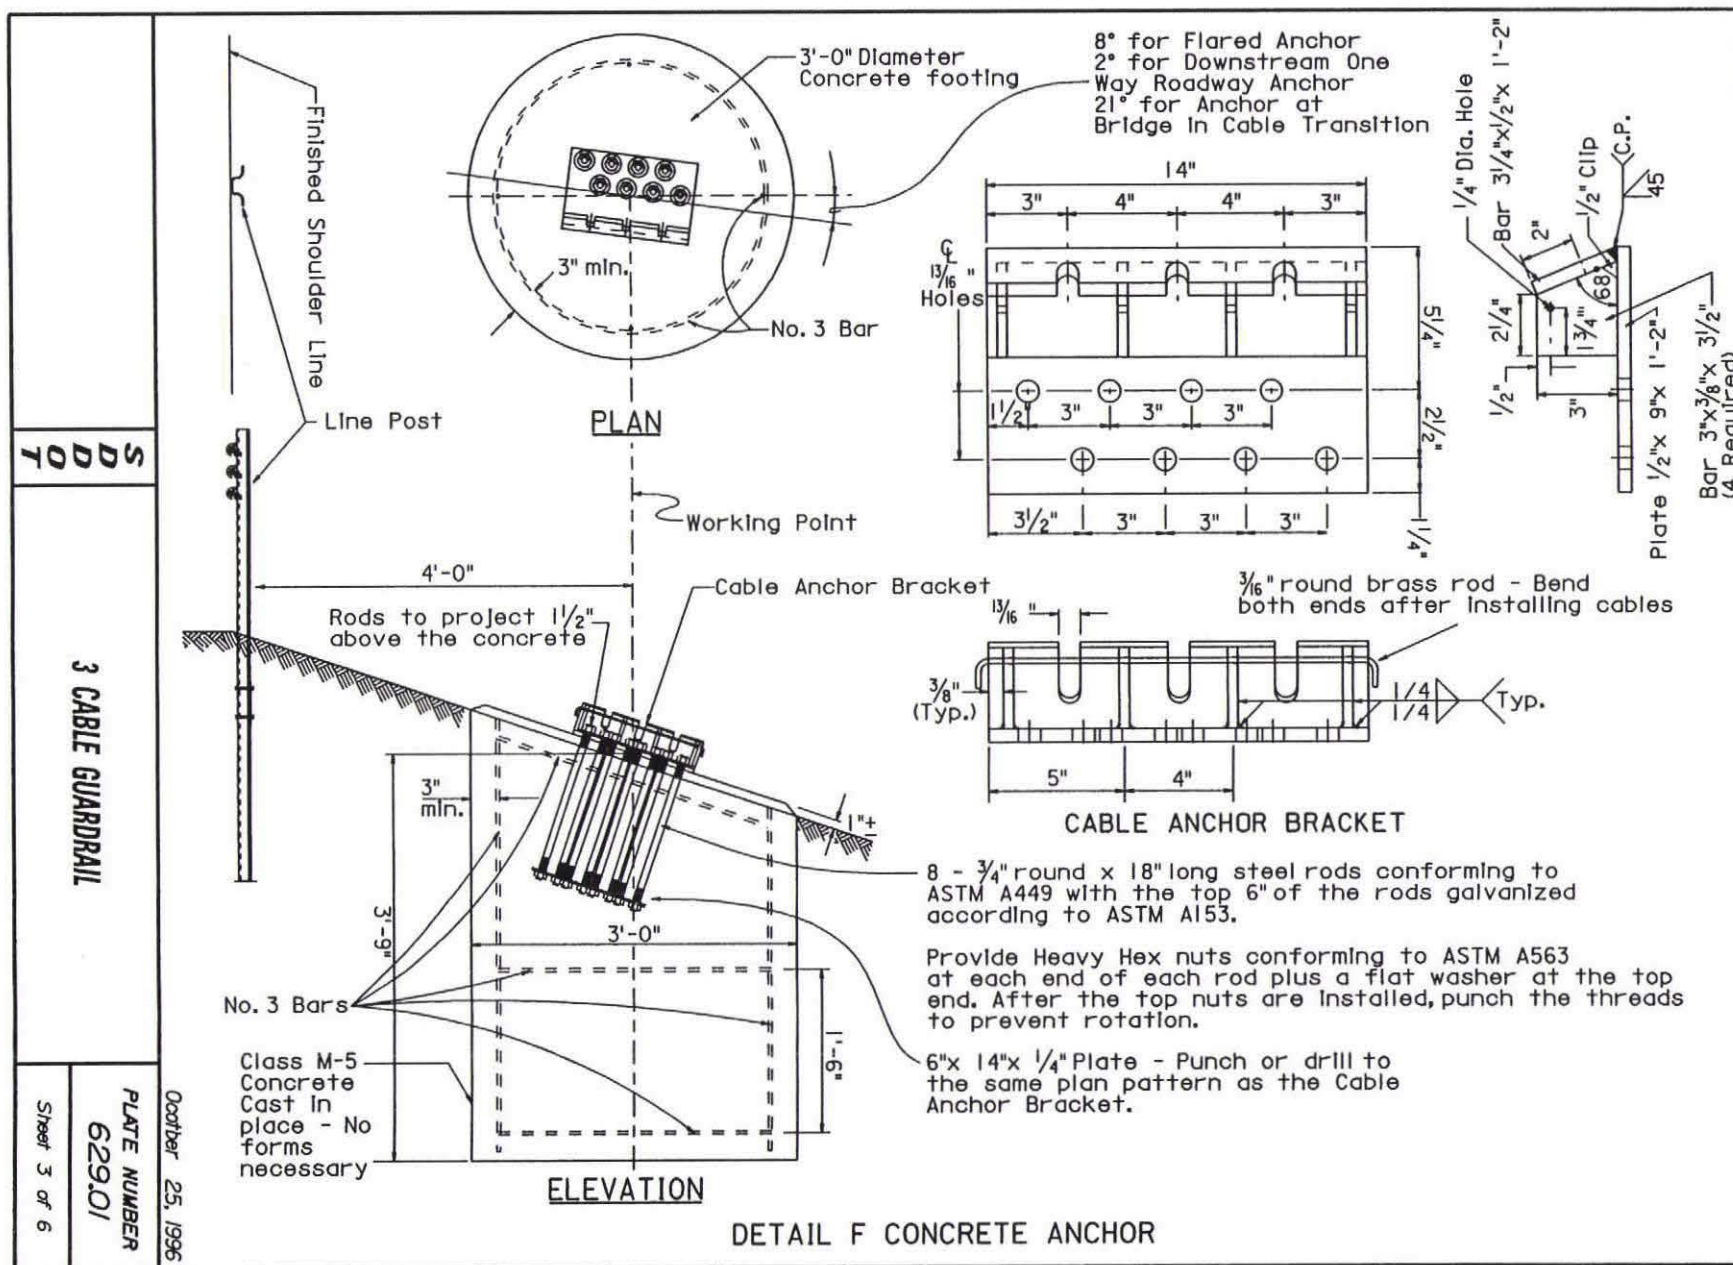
Cable Guardrail to W-Beam Transition Design Details (Continued)
